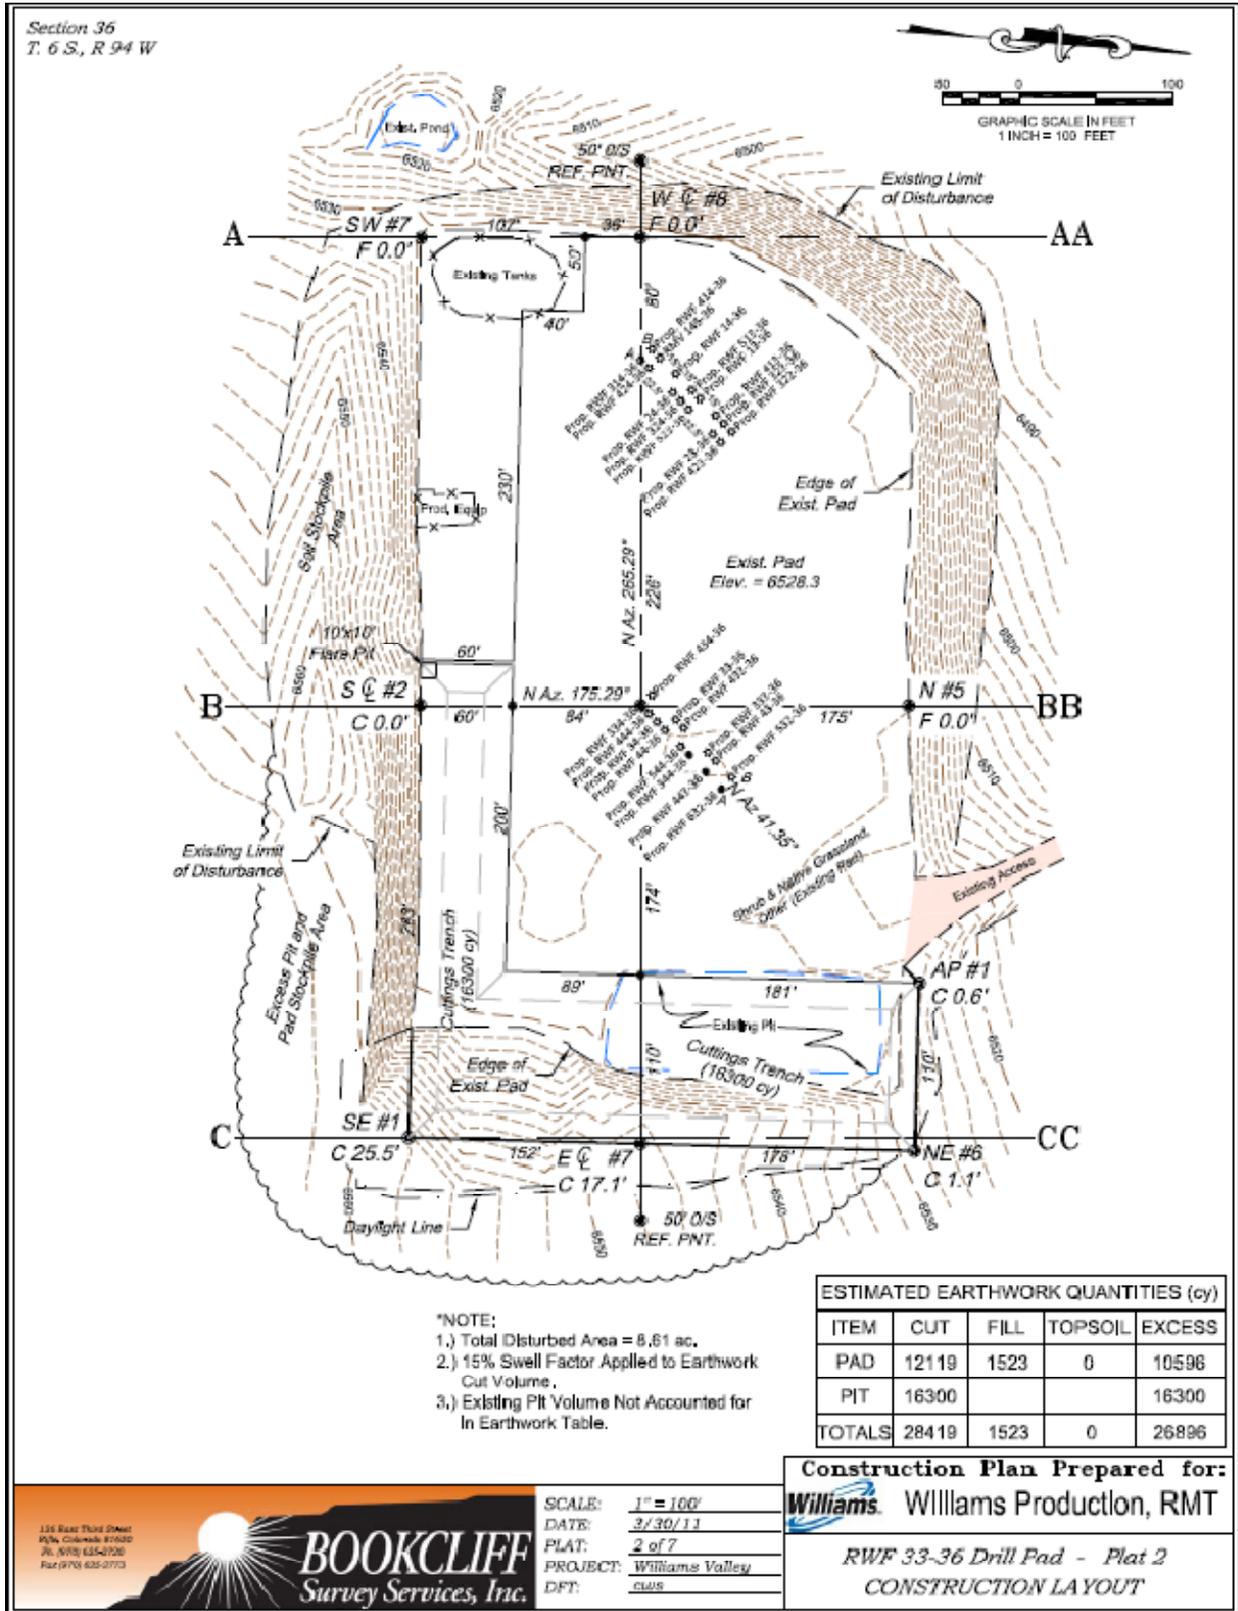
RWF33-36 Construction Layout of the Existing Pad
